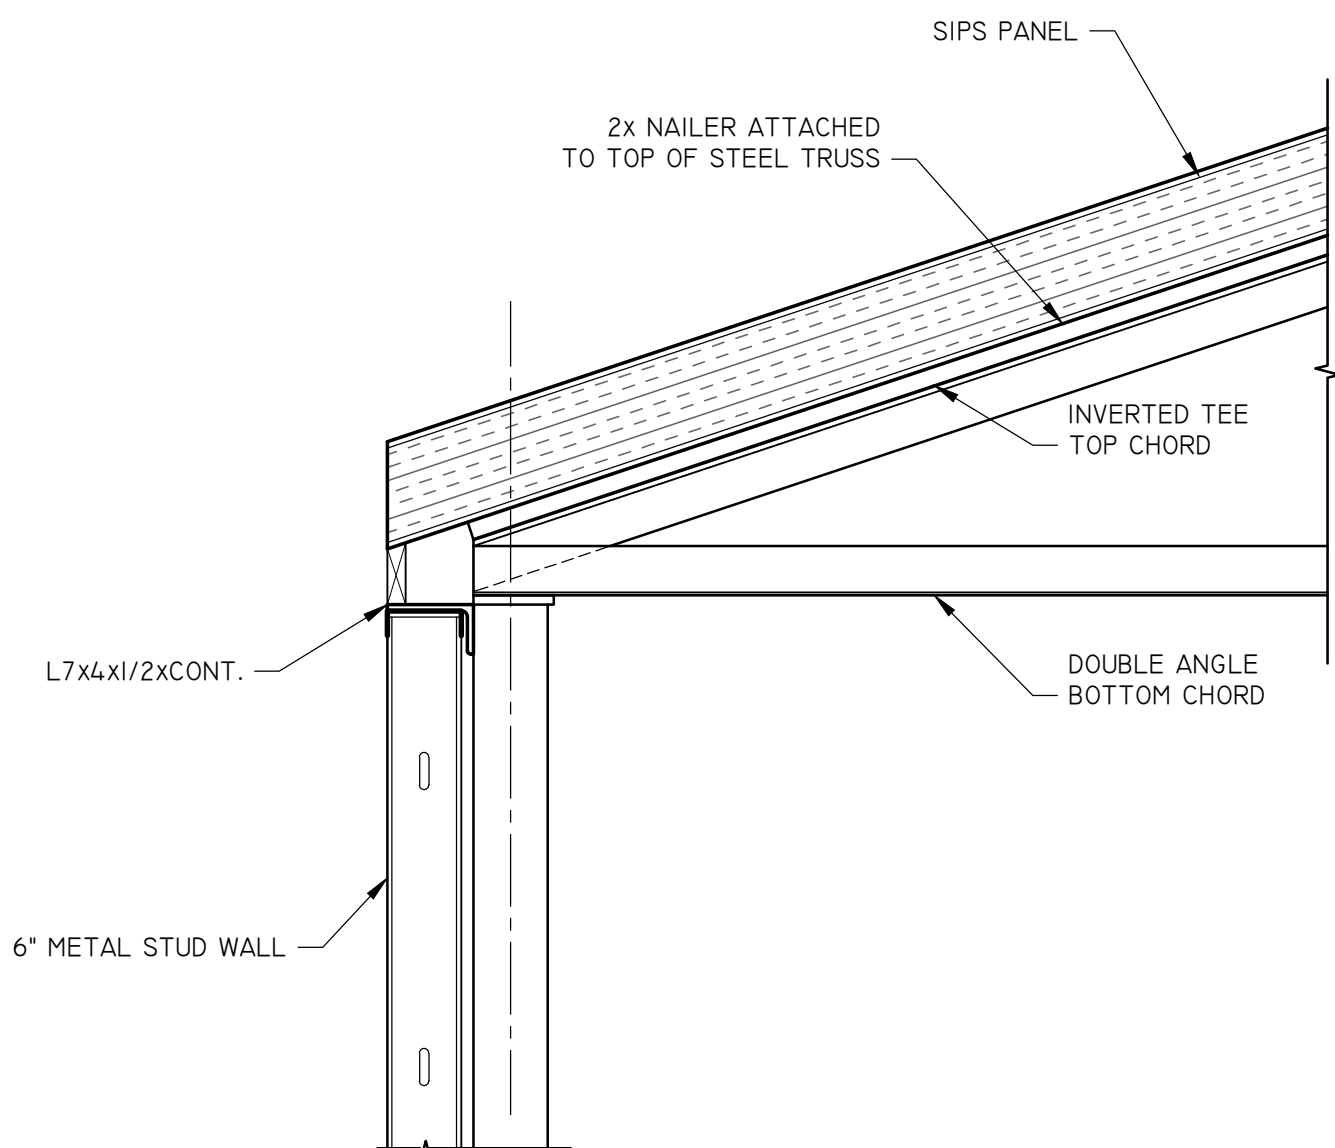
DETAIL: STEEL TRUSS AND ROOF DECK DETAIL
